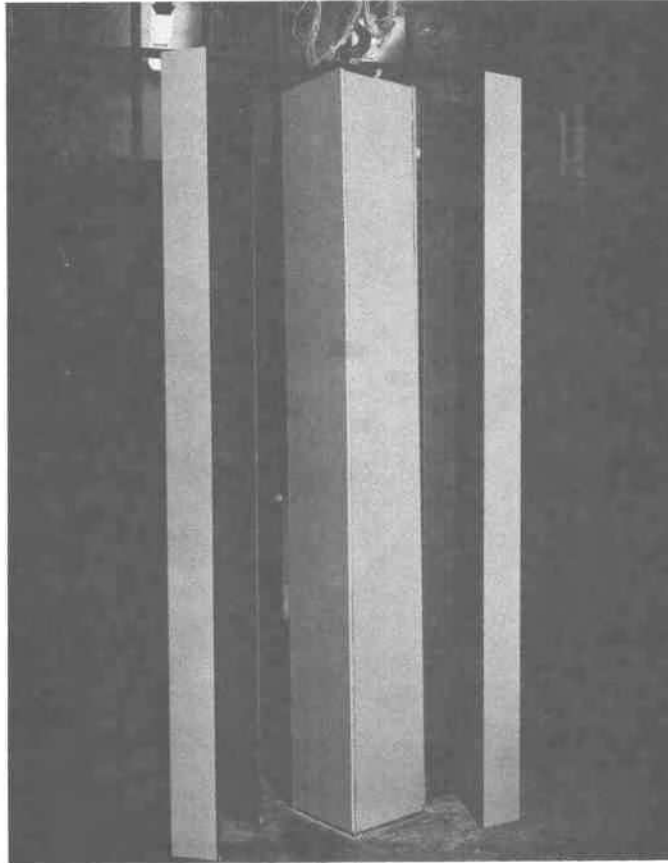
Sheet Steel Cover Positioned Adjacent to Temporarily Taped Wallboard
